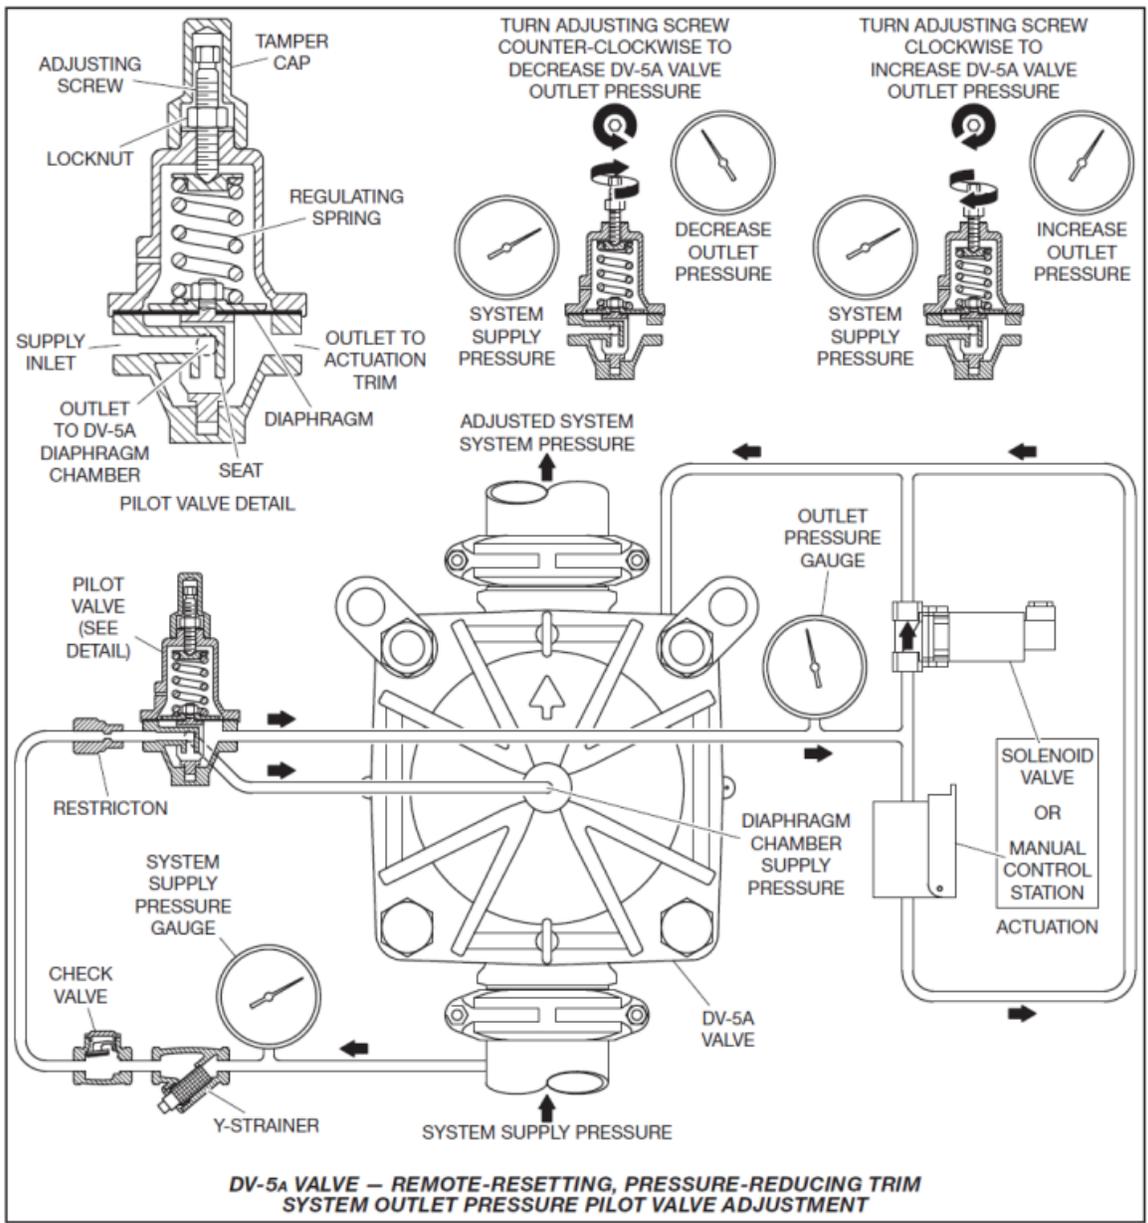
DV-5A Valve - Remote-Resetting, Pressure-Reducing Trim System Outlet Pressure Pilot Valve Adjustment
